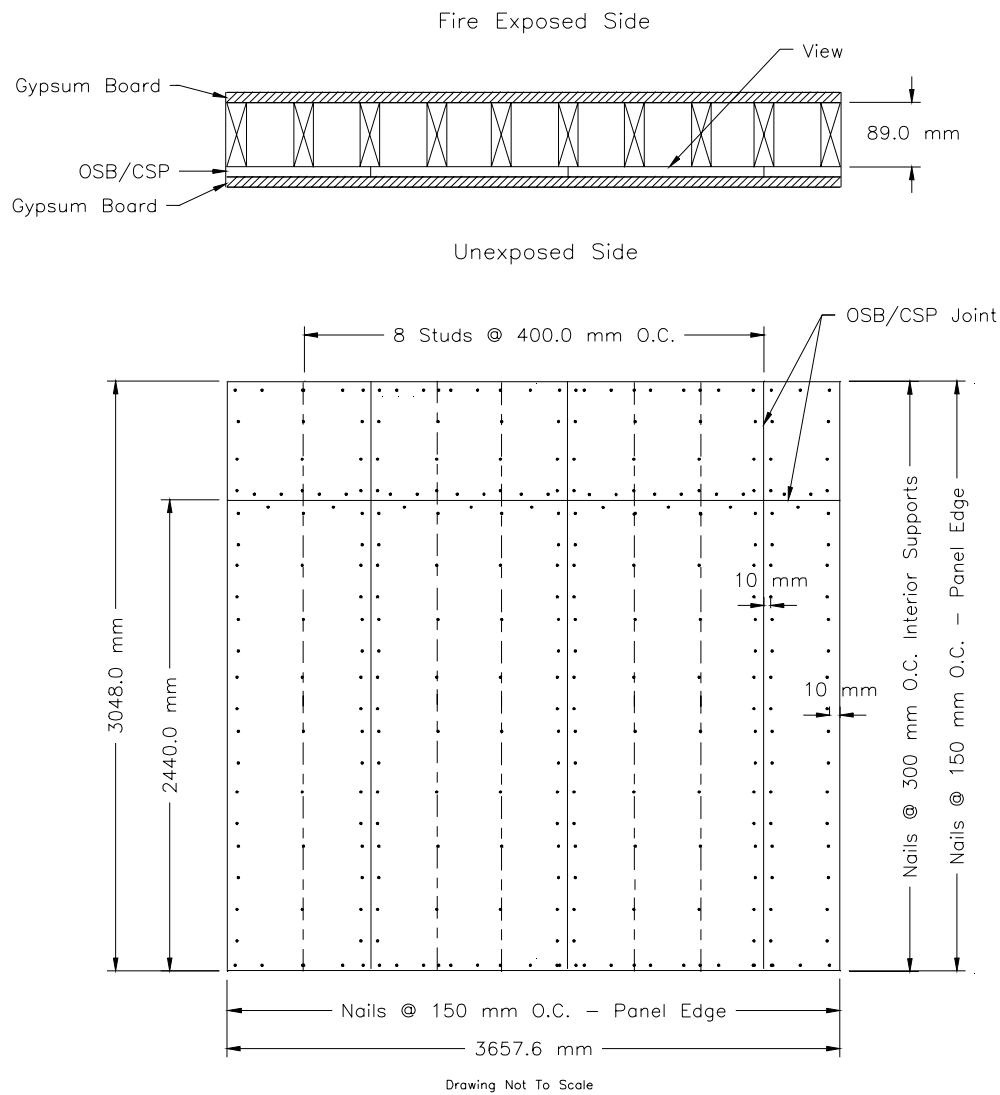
Screw Locations for Wood Stud Wall Assemblies, 1x2 Shear Membrane Layer Unexposed Side (F21, F21A, F22, F22A and F24)
